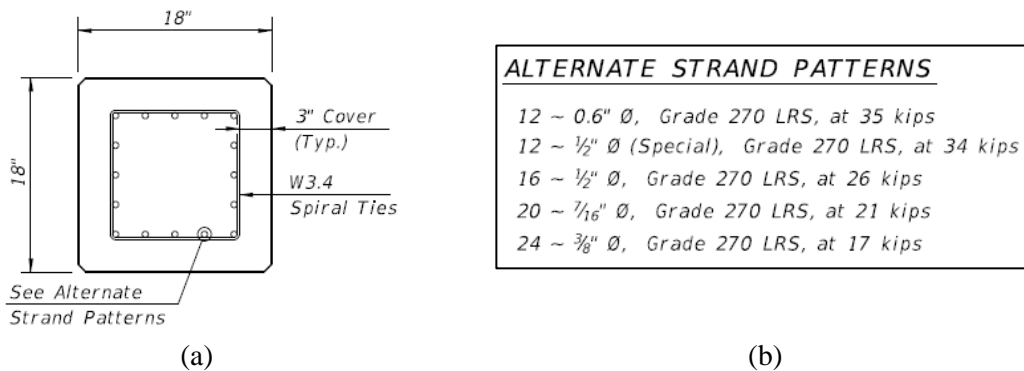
FDOT Standard Plans (a) 18-inch pile cross section (b) alternate strand patterns
